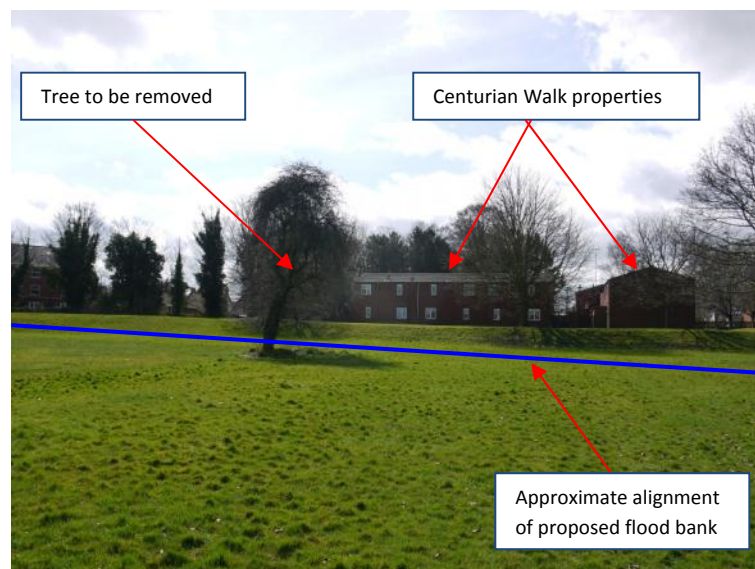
Proposed layout of flood bank at Darley Playing Fields South
